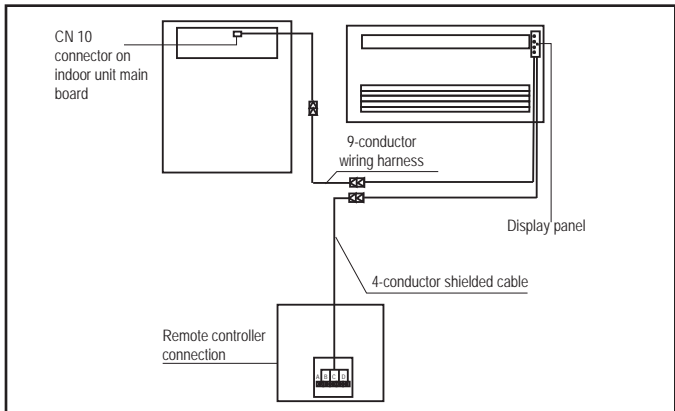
Controller Wired to Ceiling/Floor Indoor Unit (VCFA)
